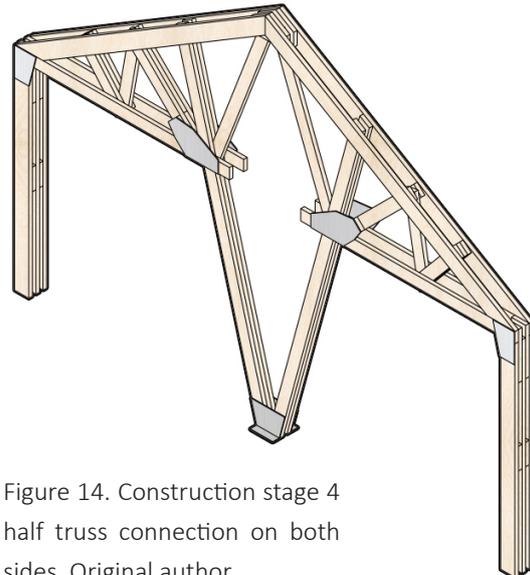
Construction stage 4 half truss connection on both sides. Original author
